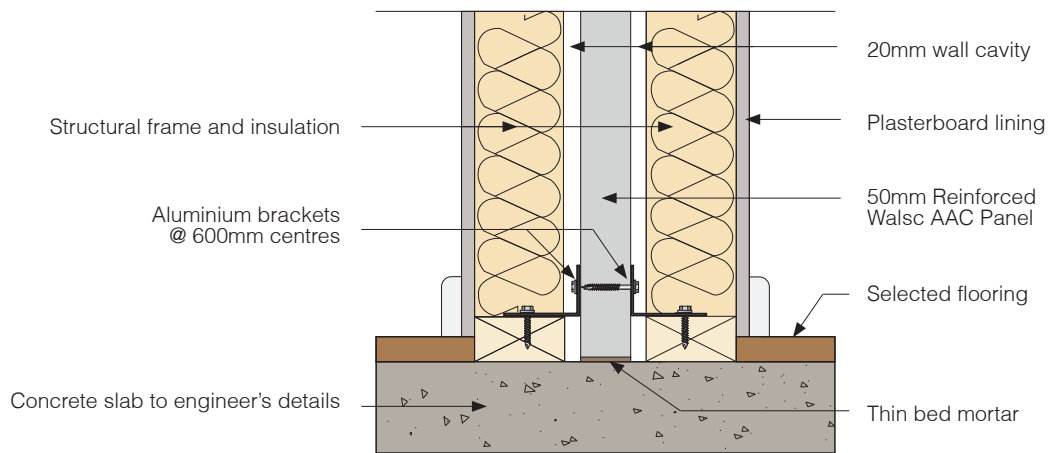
Vertically Aligned System Base of Wall Detail - Option 1
